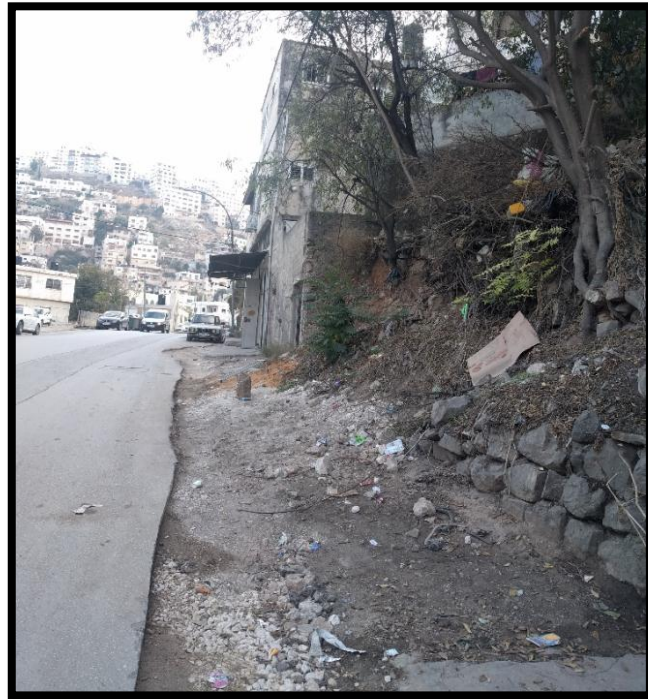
41: Photo Of Ras Al-Ain main Street Lacking Sidewalk. Source: Site Survey,2018
